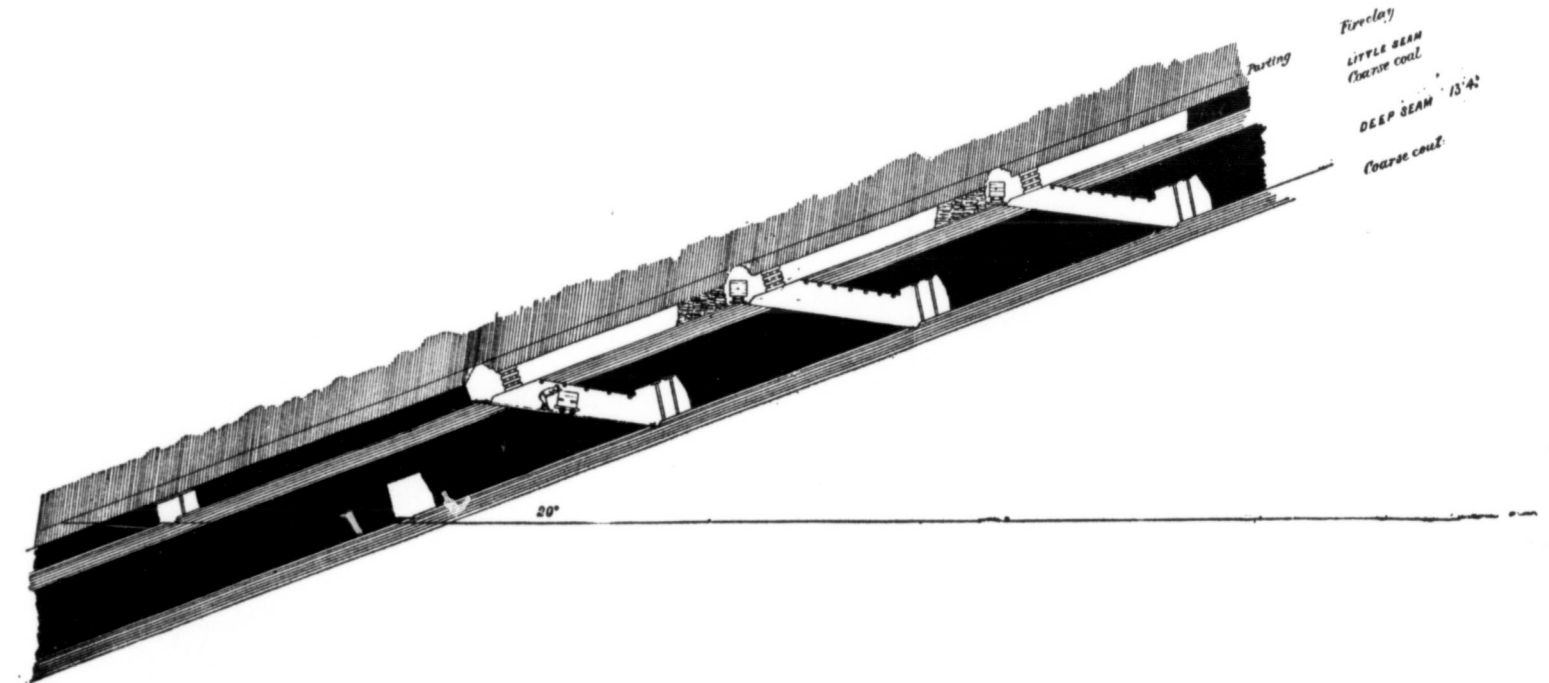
PLAN OF LONG WALL LITTLE SEAM, ALBION MINES, PICTOU CO.
